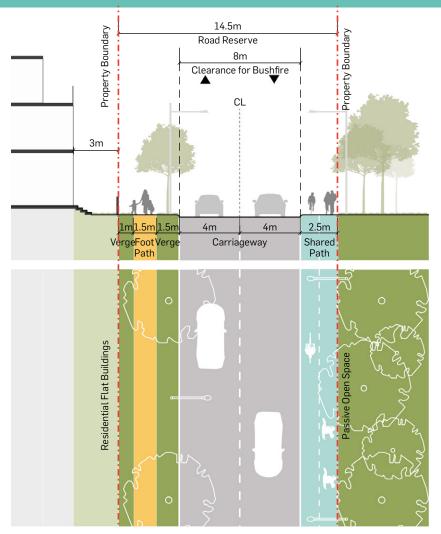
Indicative Street Section F-F' - Access Place - Bushfire Compliant
